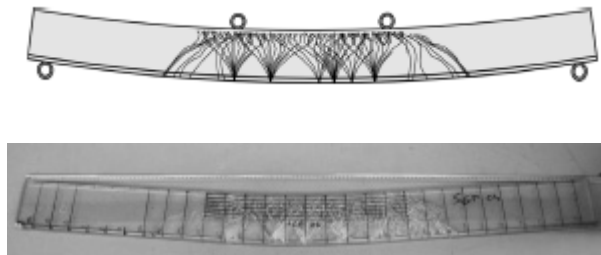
Crack pattern in SG laminated, reinforced glass beam: schematic and picture.
